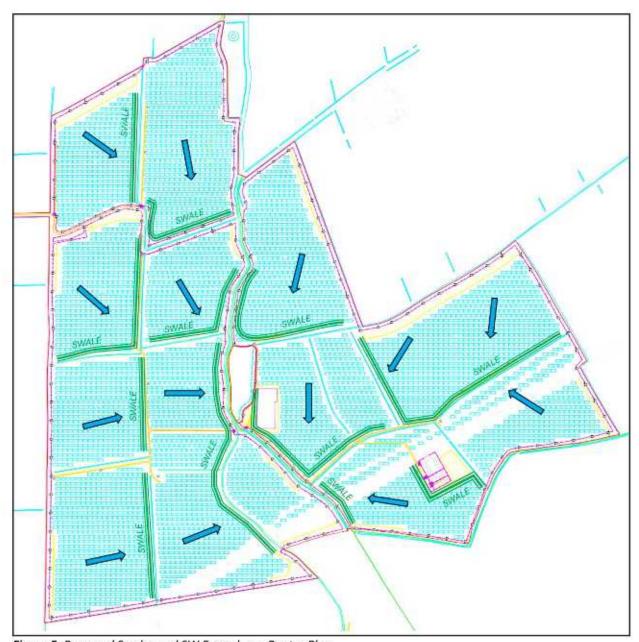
Proposed Swales and SW Exceedence Routes Plan
